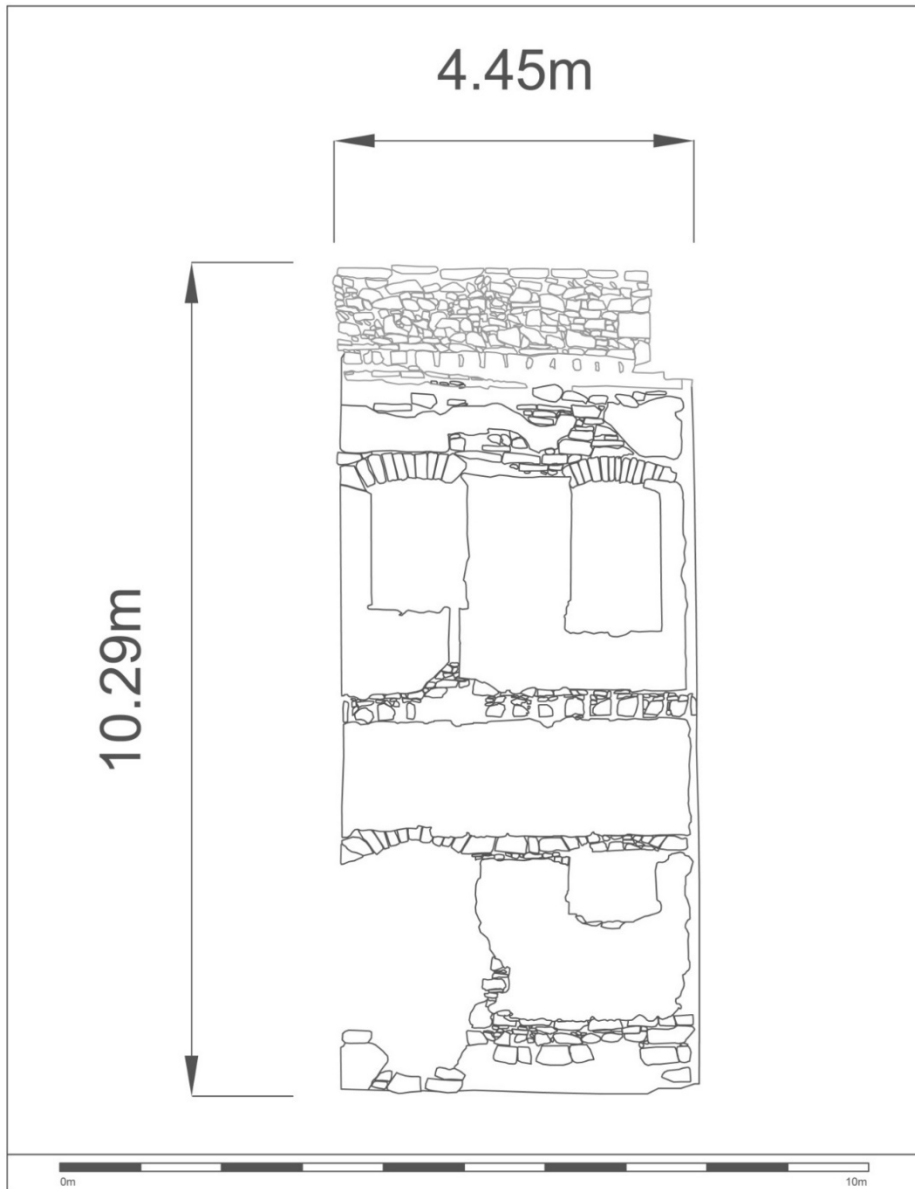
Internal elevation of east wall of the signal tower at Carrowmably Signal Station.
